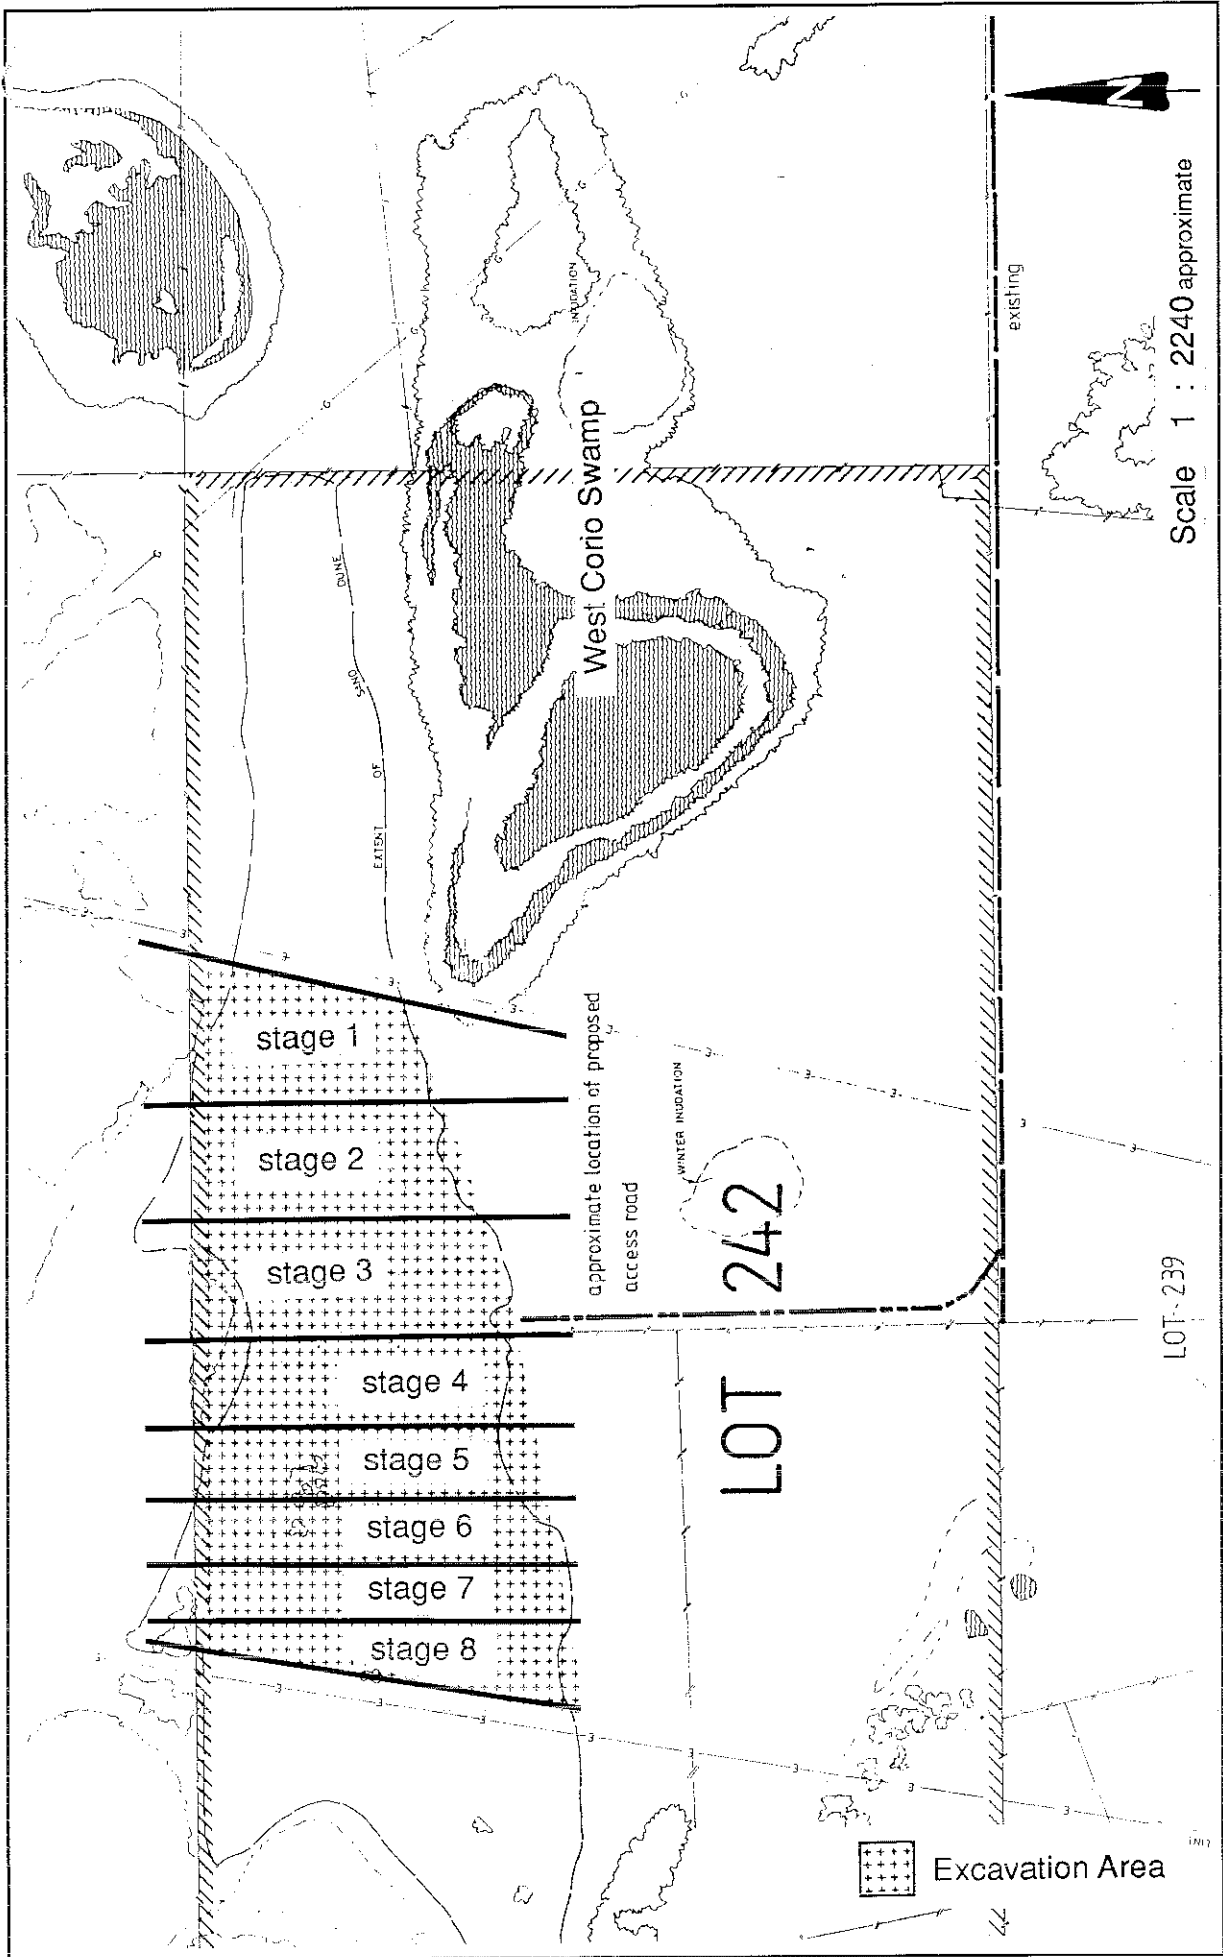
Proposed sand removal lot 242 Corio Road Pinjarra, showing proposed access road staging plan and West Corio Swamp.
